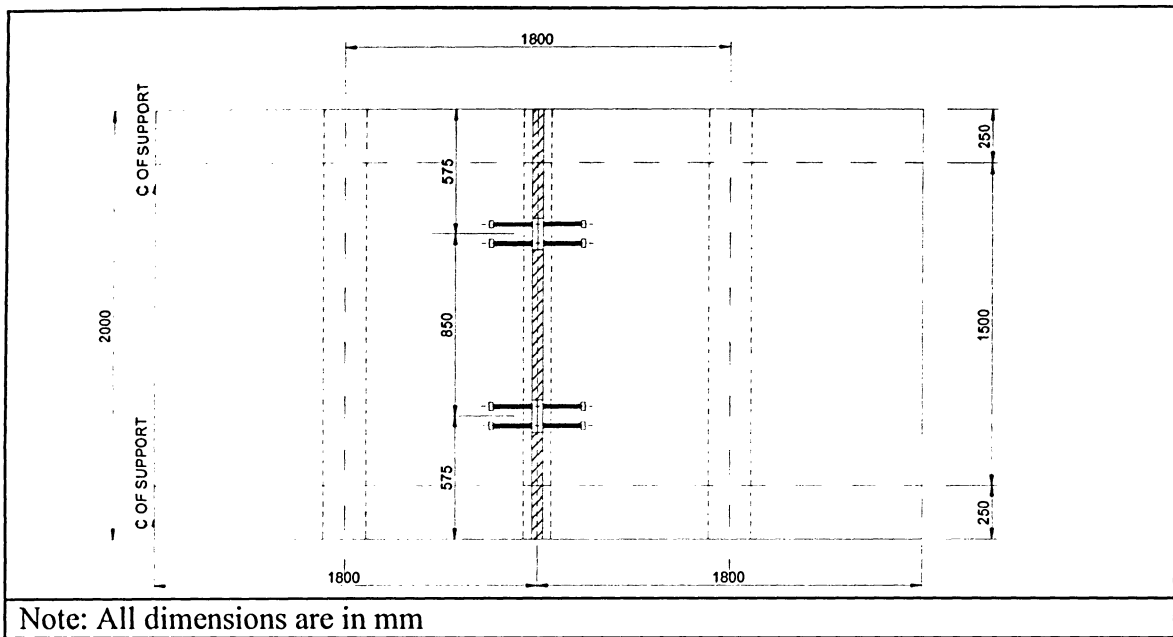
(a) Plan of Location of Bolted Connection for Model M3
